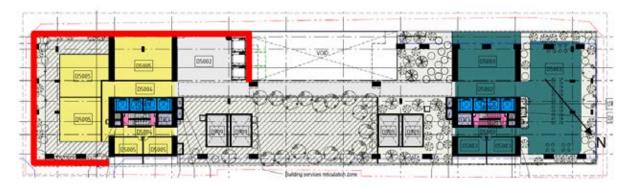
Indicative Site A podium community roof plan with proposed awning (red) around the southeast boundary.
